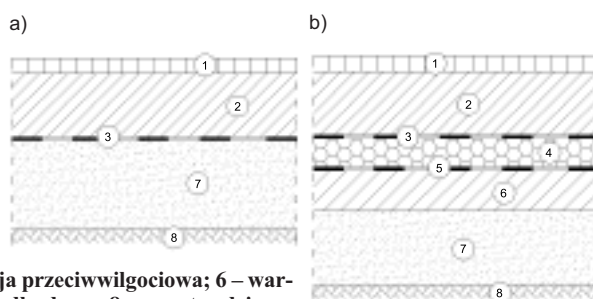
Basic industrial floor layers [2]: a) floor on the ground without thermal insulation; b) floor on the ground with thermal insulation: 1 – topcoat (floor right); 2 – primer (carrier layer); 3 – layer slip; 4 – insulation; 5 – damp-proof; 6 – alignment layer; 7 – substructure; 8 – subsoil
